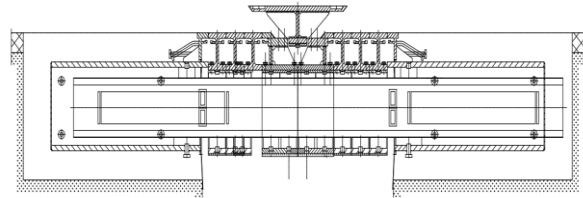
At minimum possible closing position, the fuse element is at its highest position, until this point there is no damage to the expansion joint. Further closing will damage other joint components.
